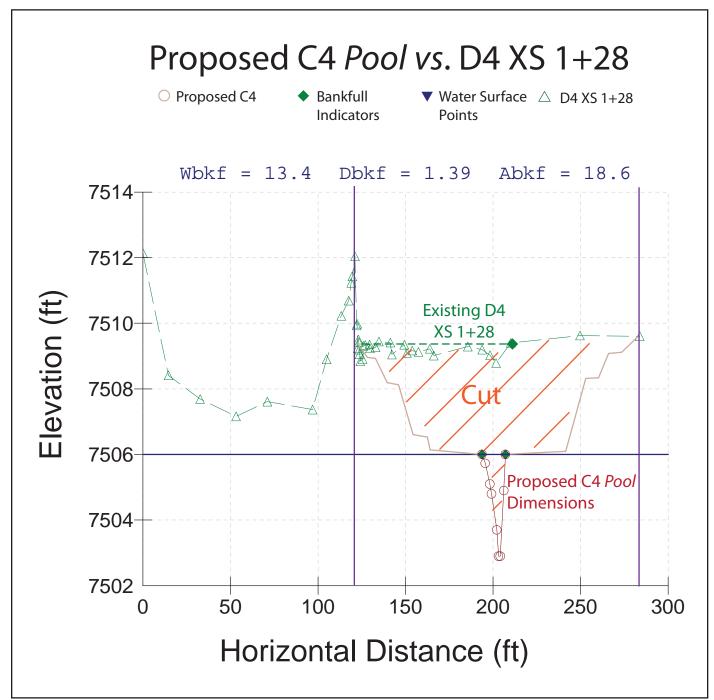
The proposed C4 pool cross-section compared to the existing D4 cross-section 1+28 below the West Creek road.
